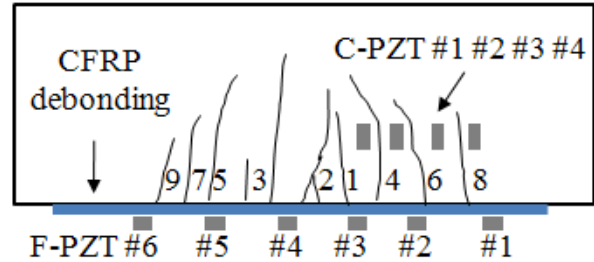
Crack appearance of CFRP strengthened concrete beam
